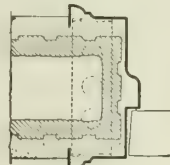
SPECIAL MOULDED STEEL BUCKS
